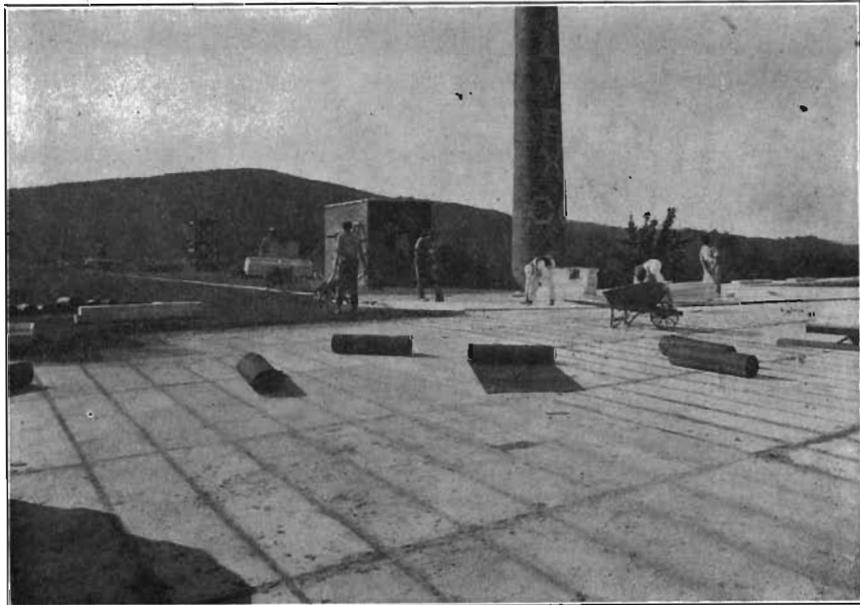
Surfacing a gypsum tile roof. Courtesy United States Gypsum Co.
